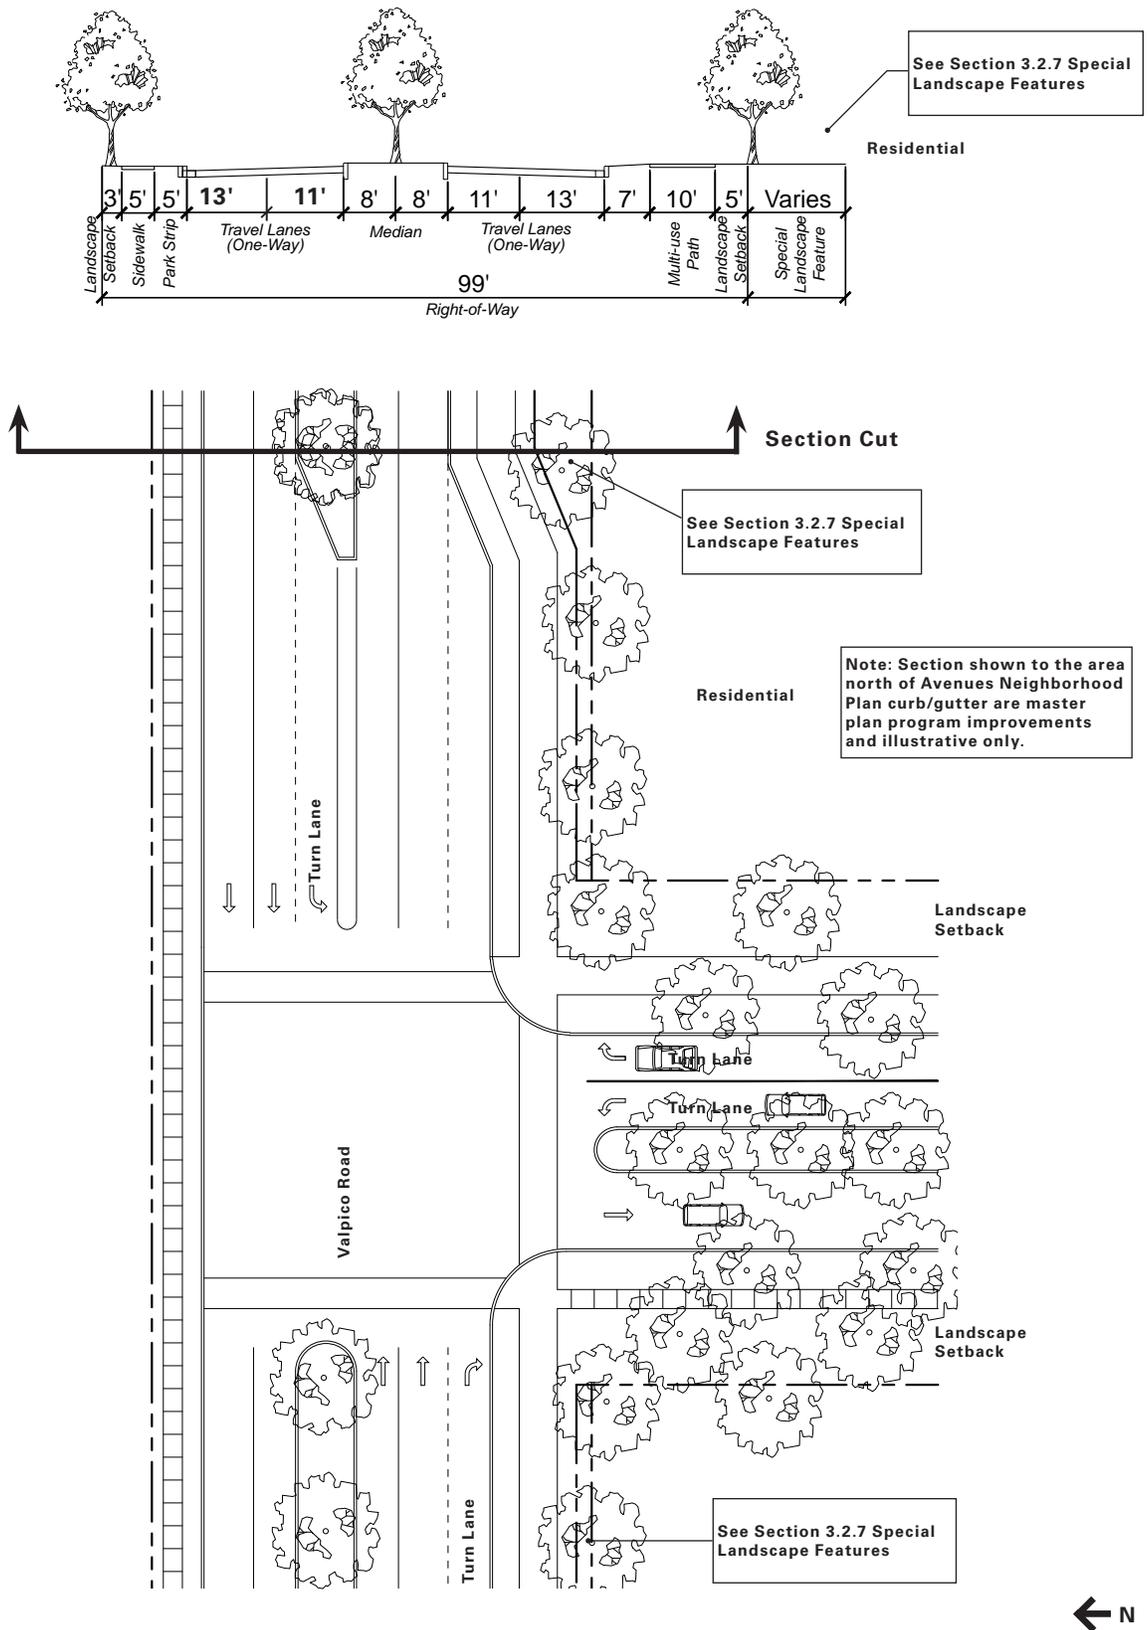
Section and Plan: Regional Arterial – Valpico Road, Designation A (Final Build-out)
